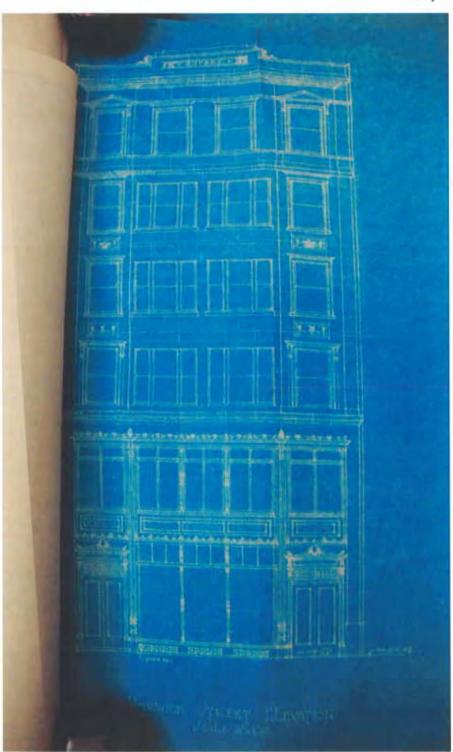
1924 Duprey Building east elevation. Reproduced by permission from the Massachusetts State Archives.
